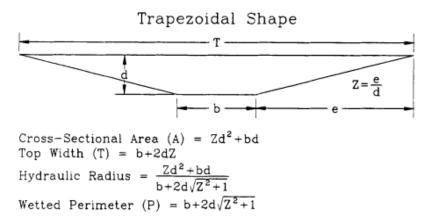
Typical Waterway Shapes and Mathematical Expressions for Calculating Crosssectional Area, Top Width, Hydraulic Radius, and Wetted Perimeter (Source Livingston et al 1988)
